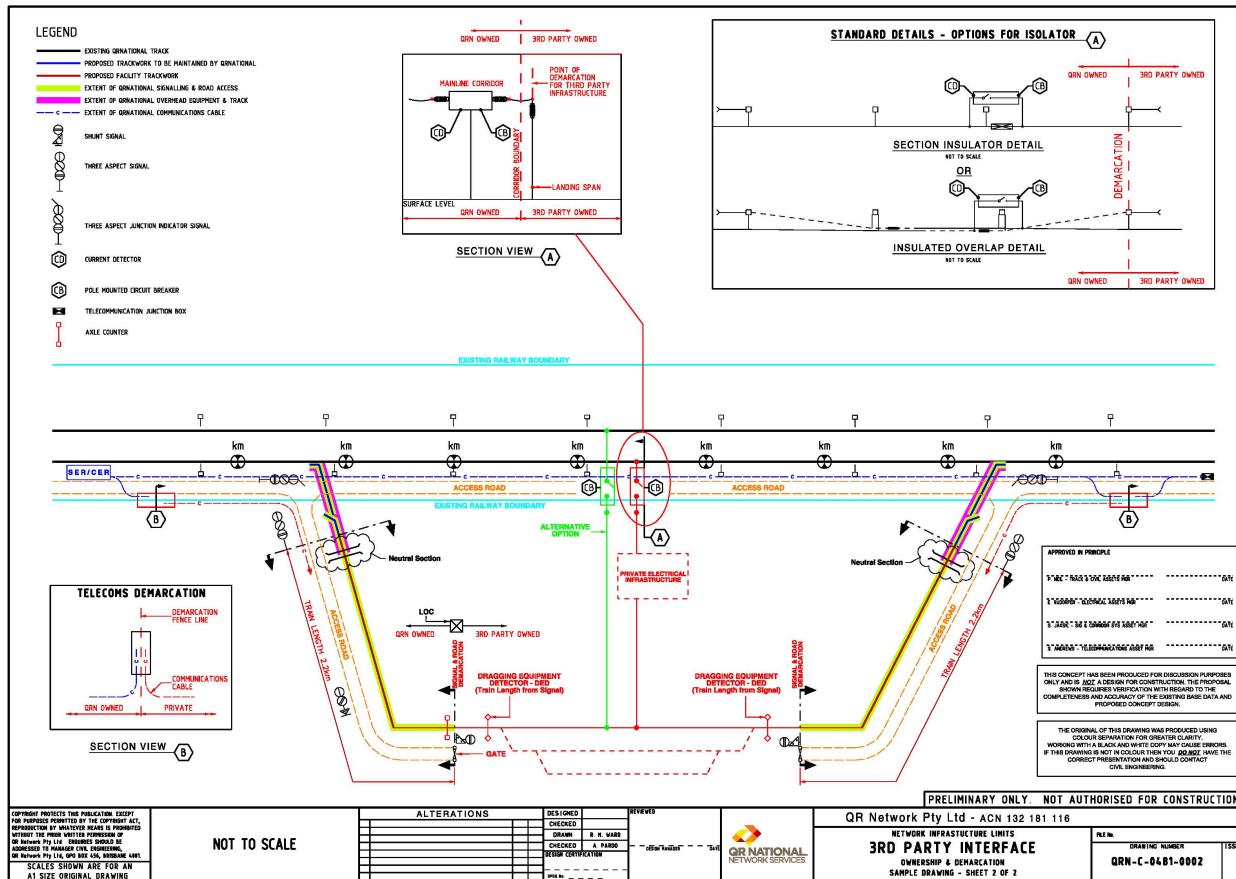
Connecting a Siding (short yard siding, dual connection, single angles)
